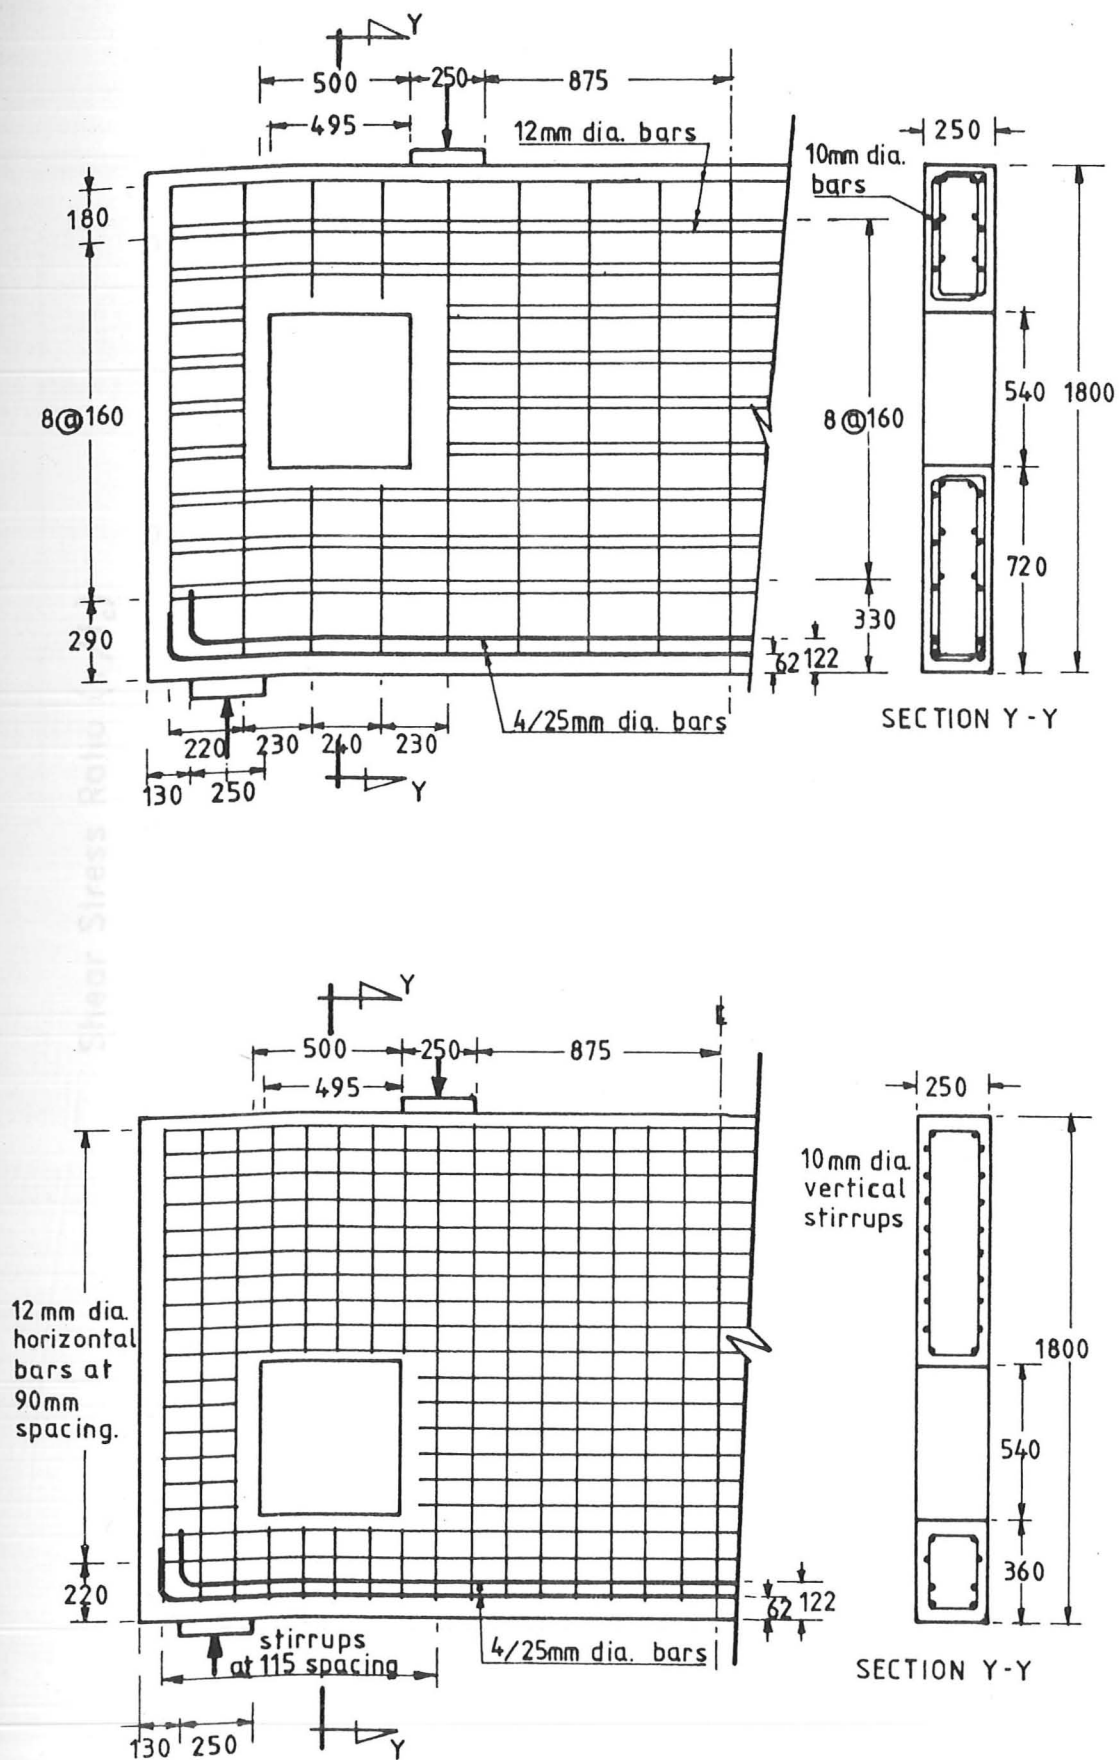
Details of deep beams with web openings reported by Kong and Kubik (1979) - dimensions in mm. Top: beams N1-A and L1-A, and bottom: beams N4-B and LA-B.
